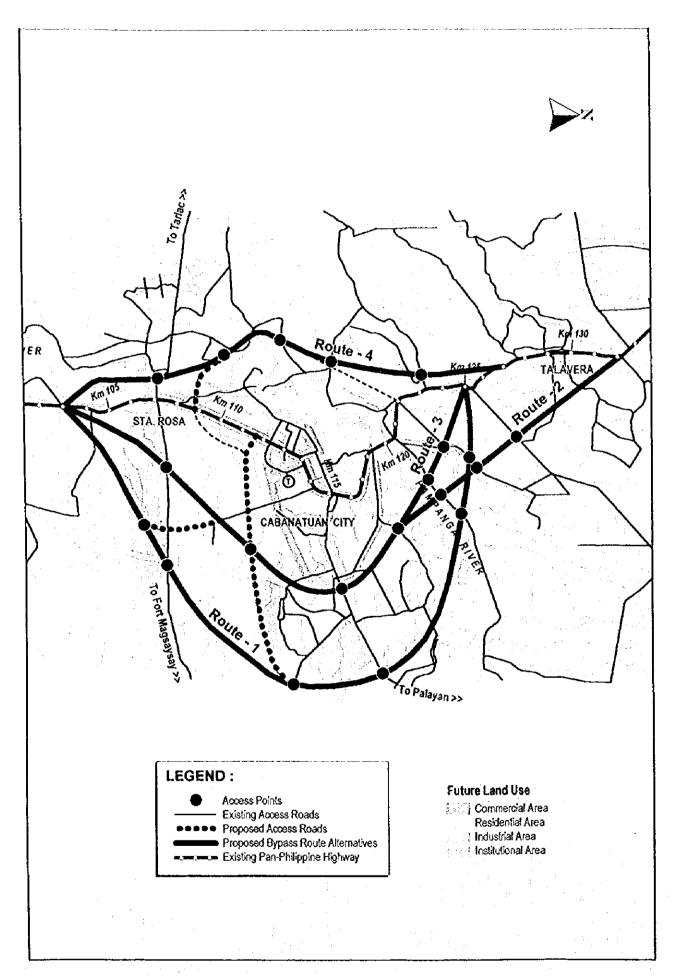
4 PROPOSED ACCESS ROADS CABANATUAN BYPASS
